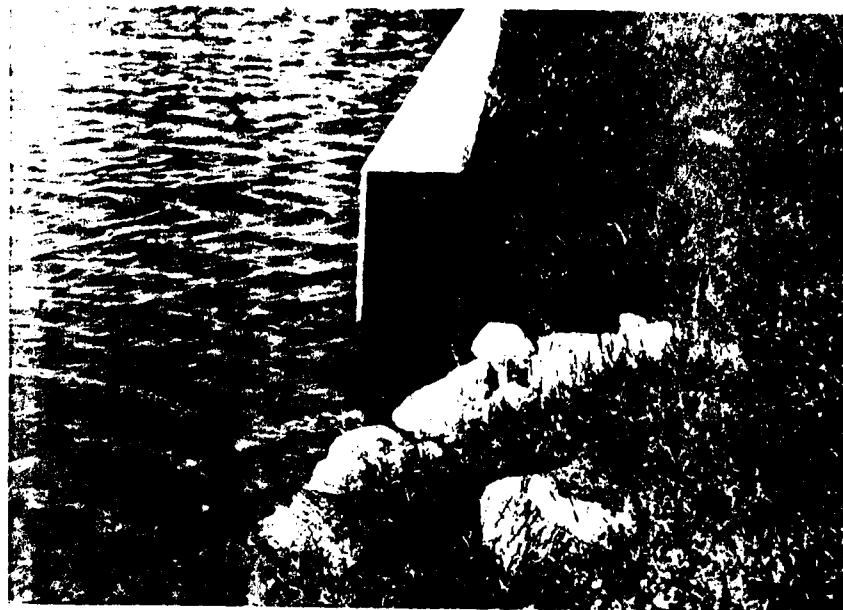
Eroded area on upstream face at right end of spillway wingwall.
